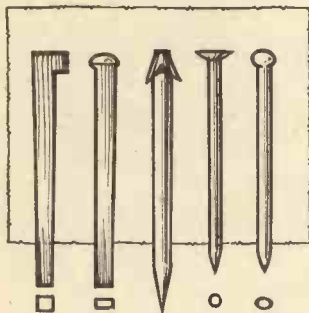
Nails. (Left to right) Cut brad, cut clasp nail, wrought nail, French or wire nail, and oval brad.
